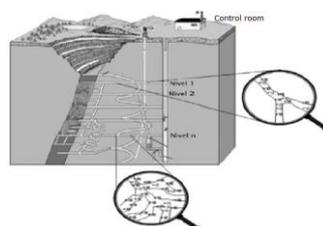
Transverse section of the Chuquicamata and their plan to open tunnels
